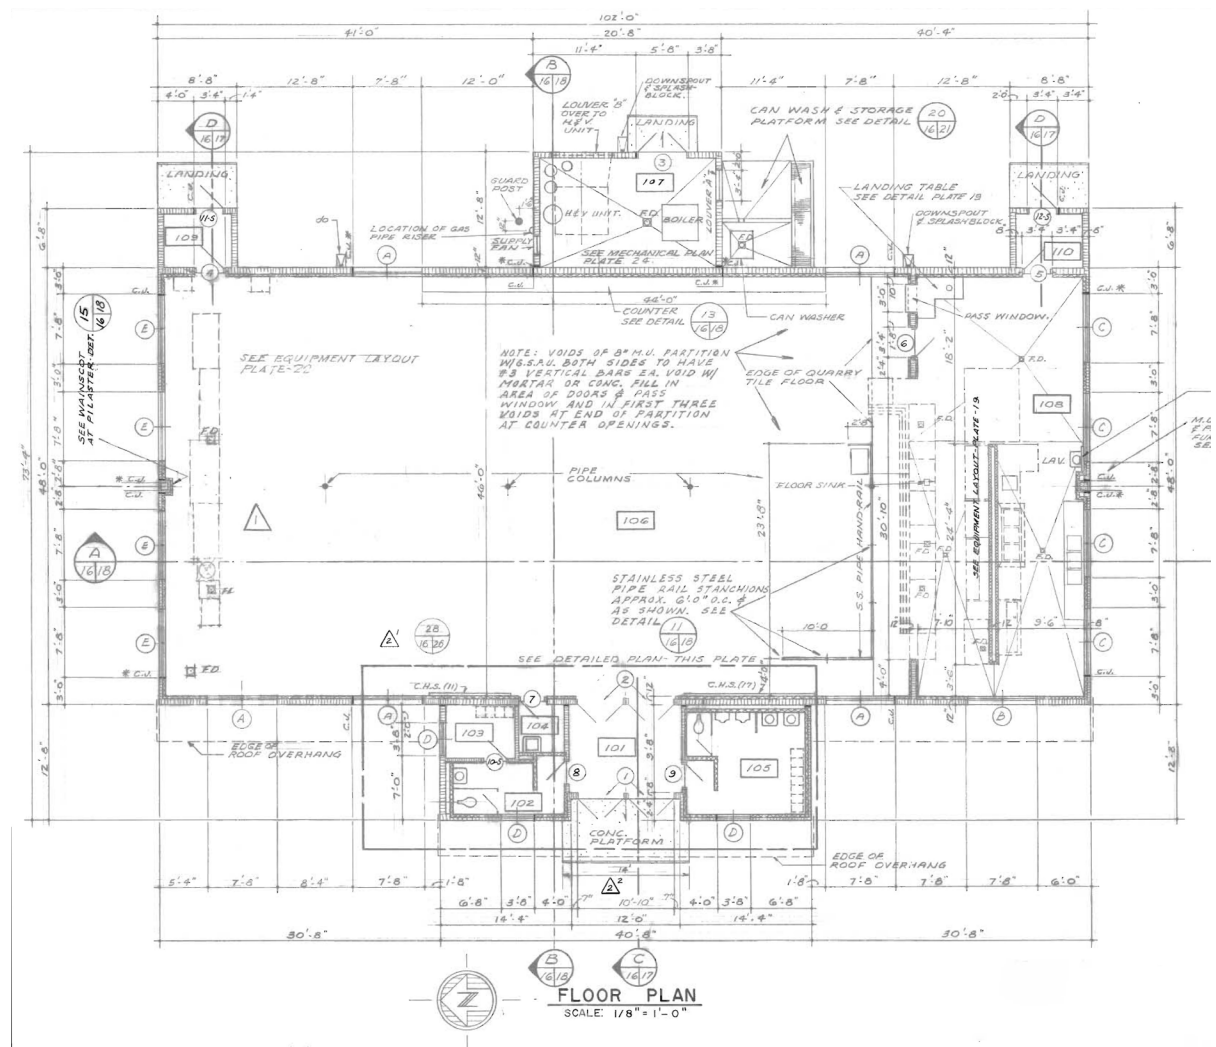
Property 23632, floor plan from 1959 WS-IE plans.
